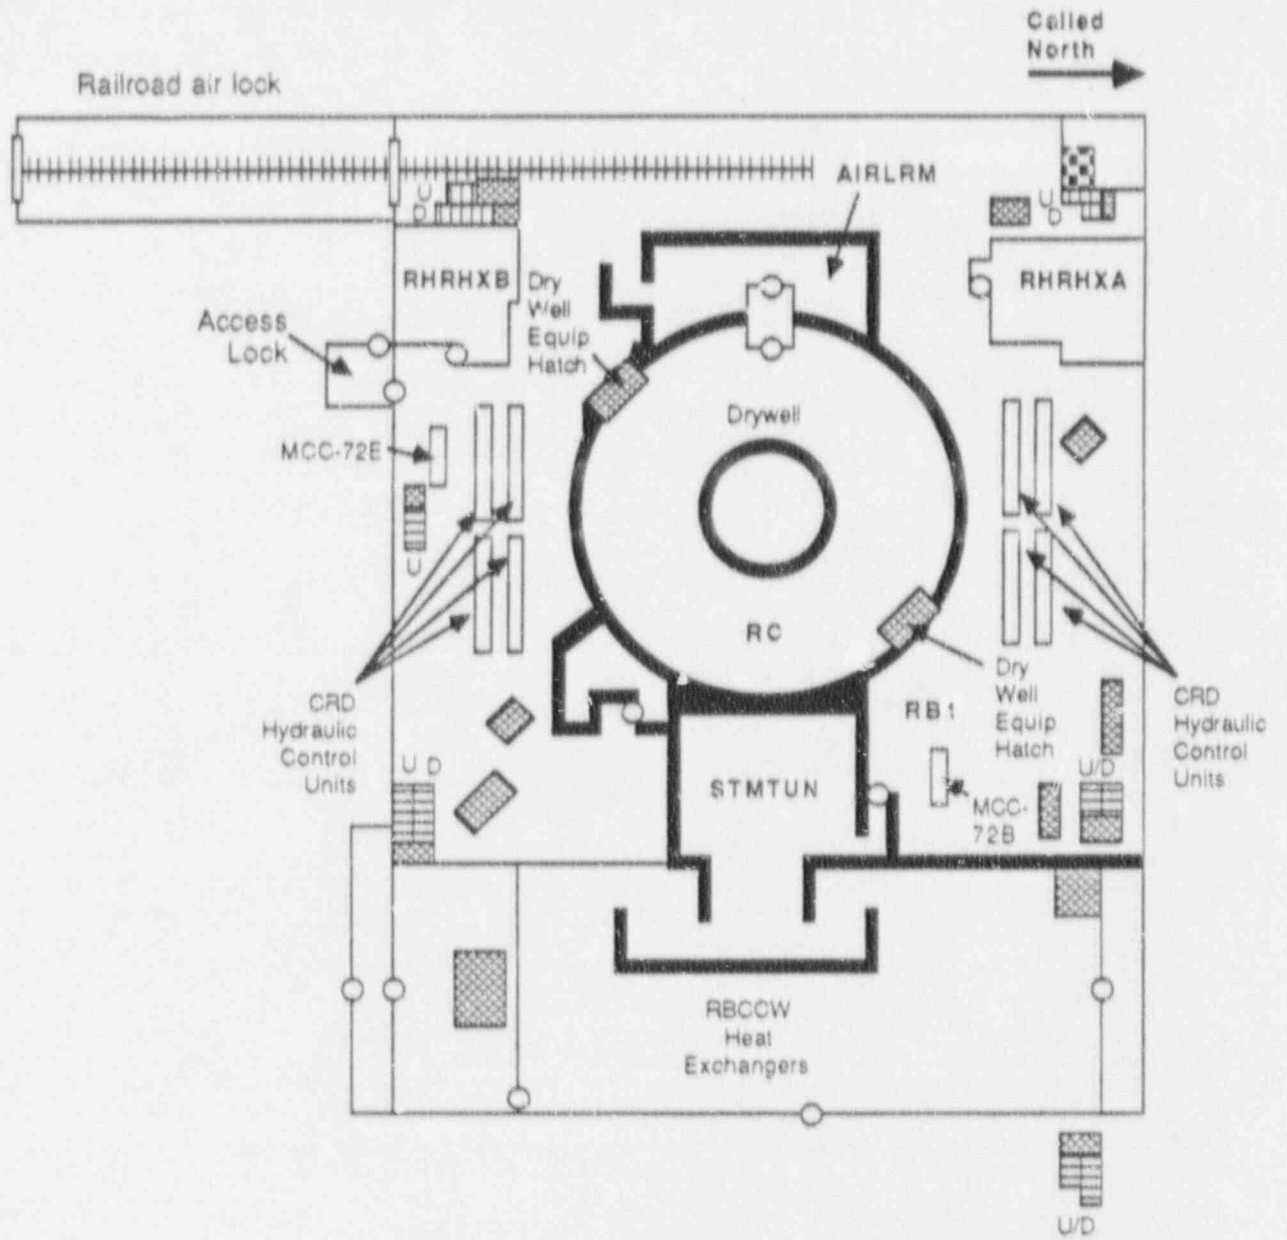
Enrico Fermi Unit 2 - Reactor Building and Auxiliary Building - 583 ft. Elevation
